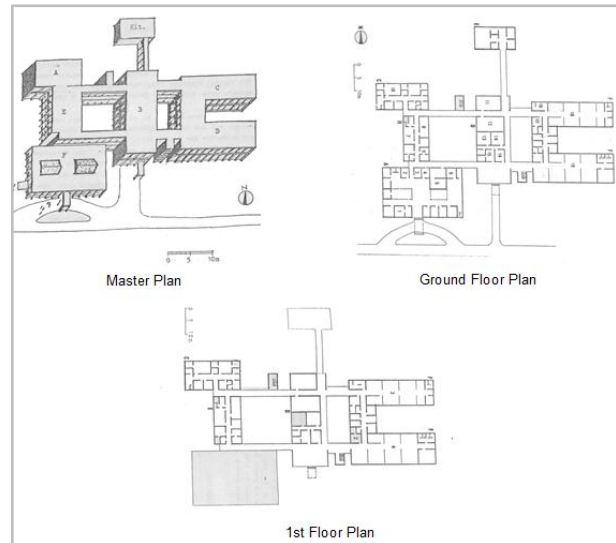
All Floor Plans of Hospital 'D' (Hussain, 1988)
